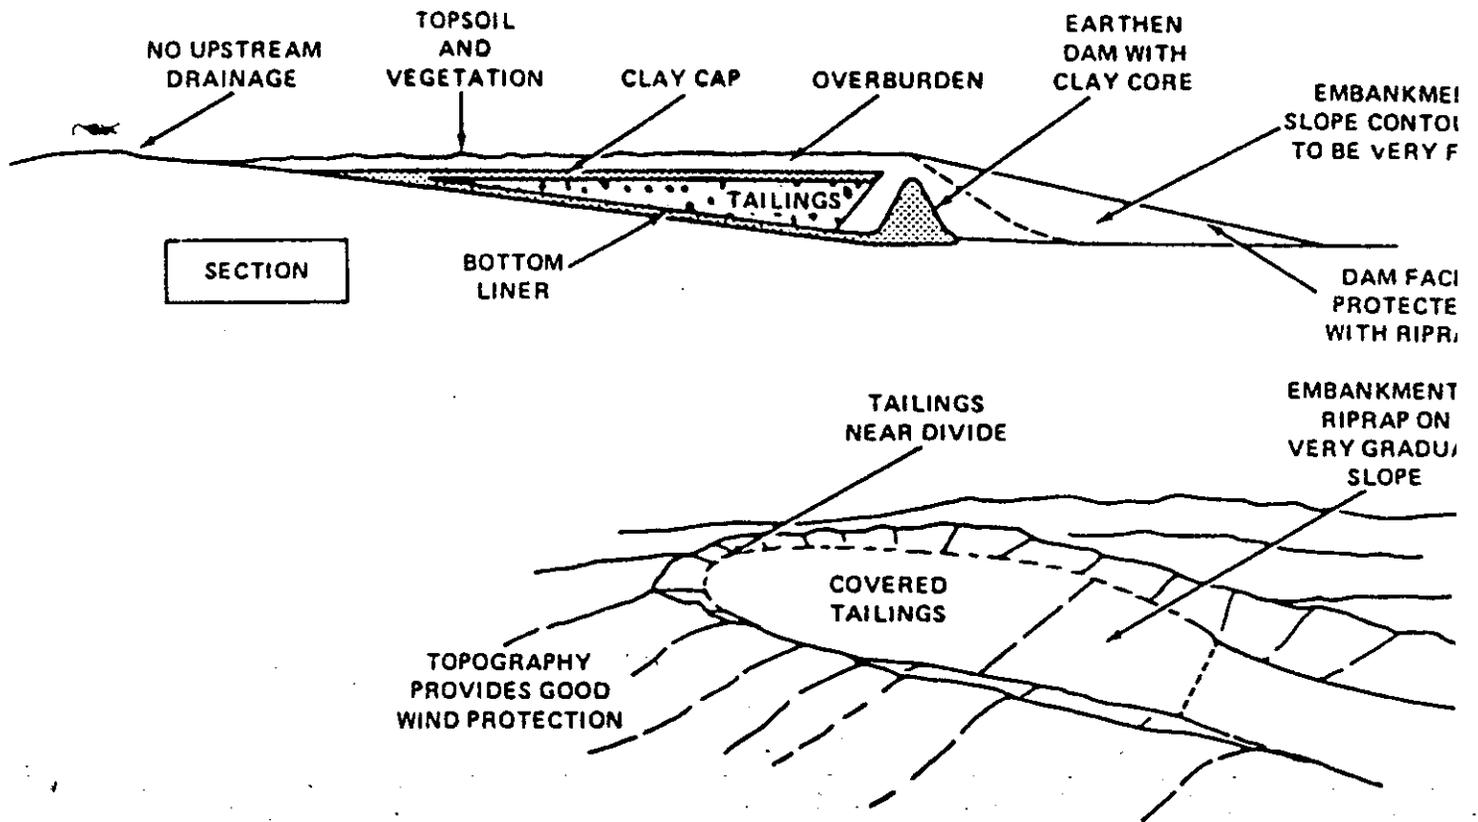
Tailings Disposed above grade with special siting and design featu
